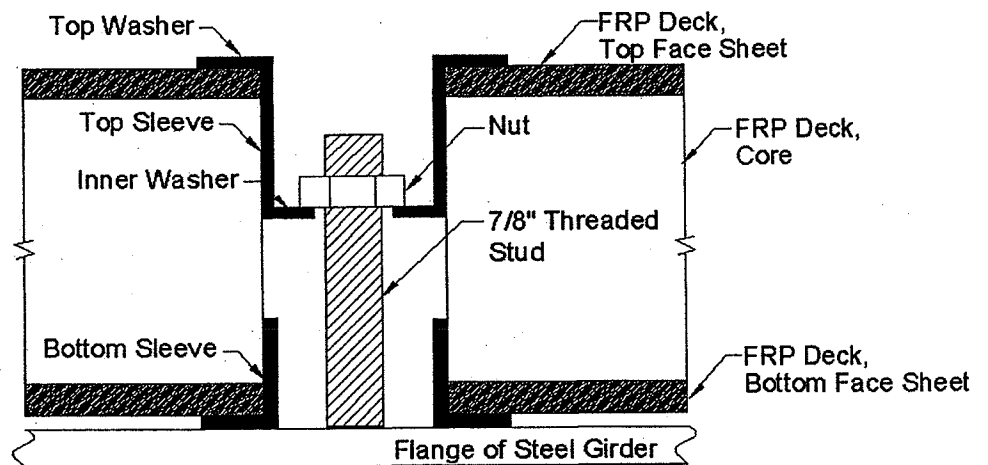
Panel Connected to Girder with Type 2 Connection
